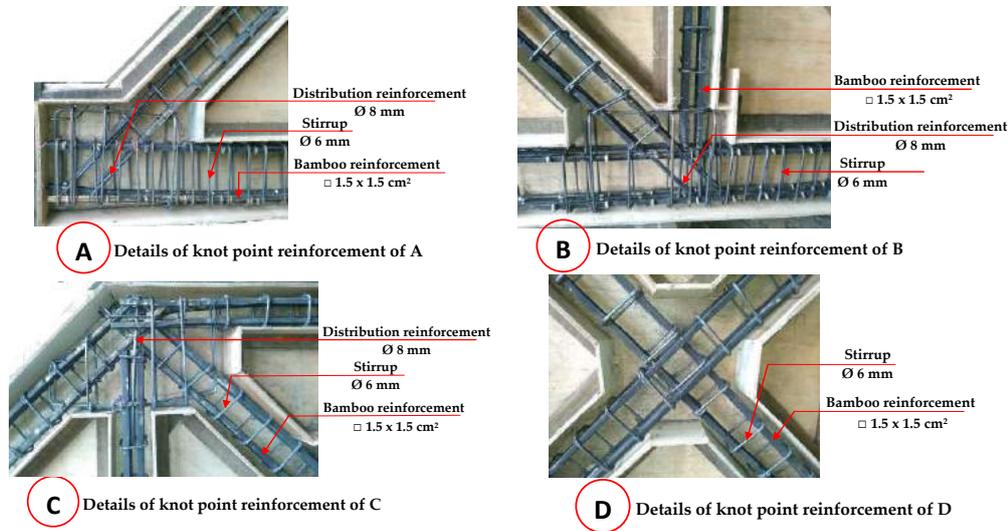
Details of the knot reinforcement for the bridge frames [38].
